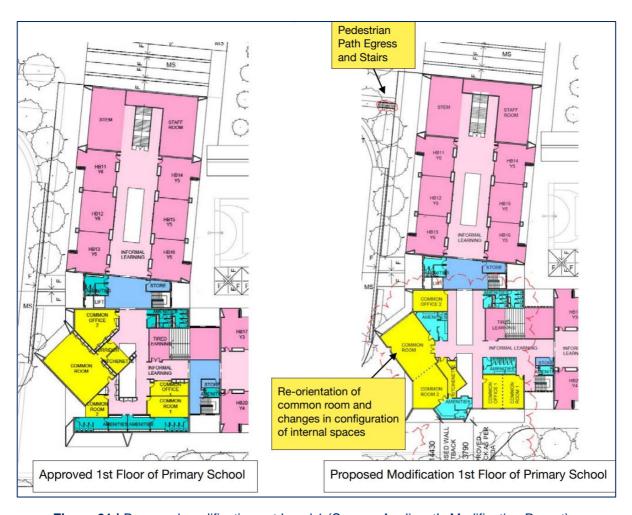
| Proposed modifications at Level 1 (Source: Applicant's Modification Report)
